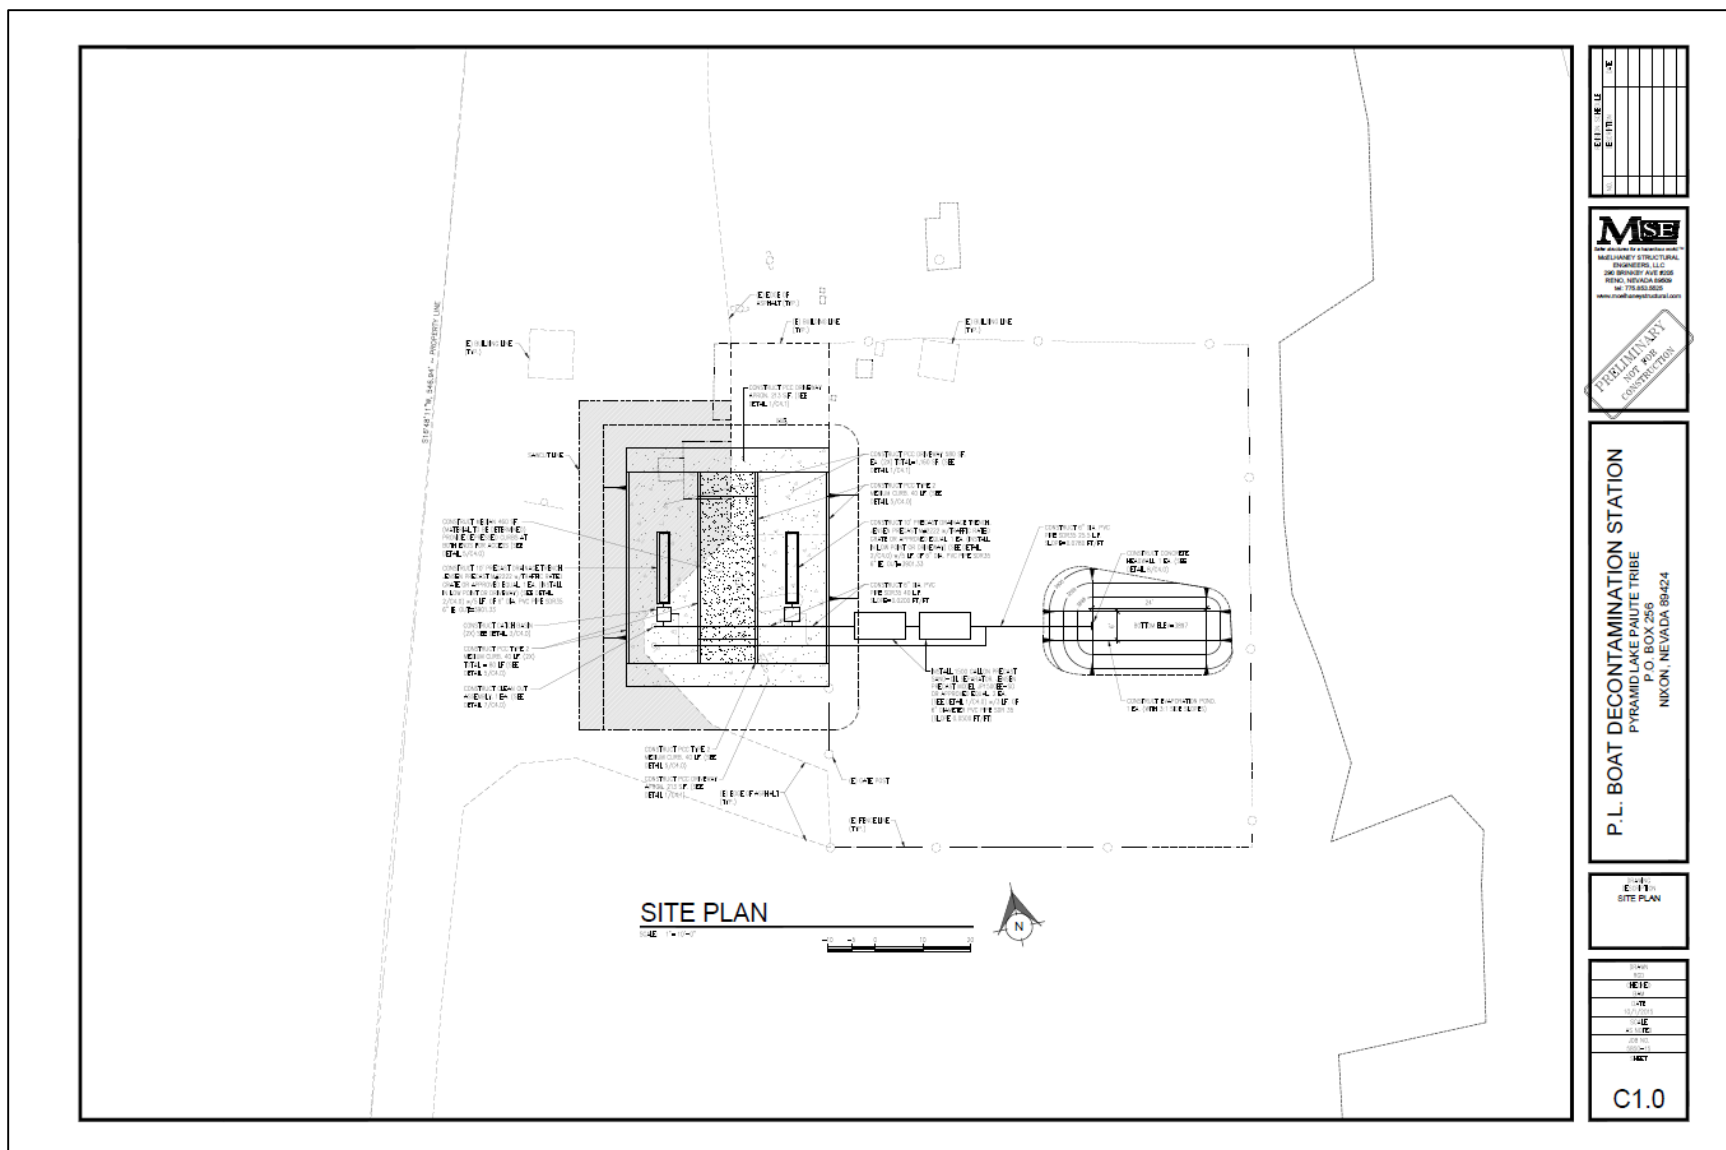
Site Plan for Construction of Pyramid Lake Watercraft Inspection Station, Sutcliffe, Nevada.
